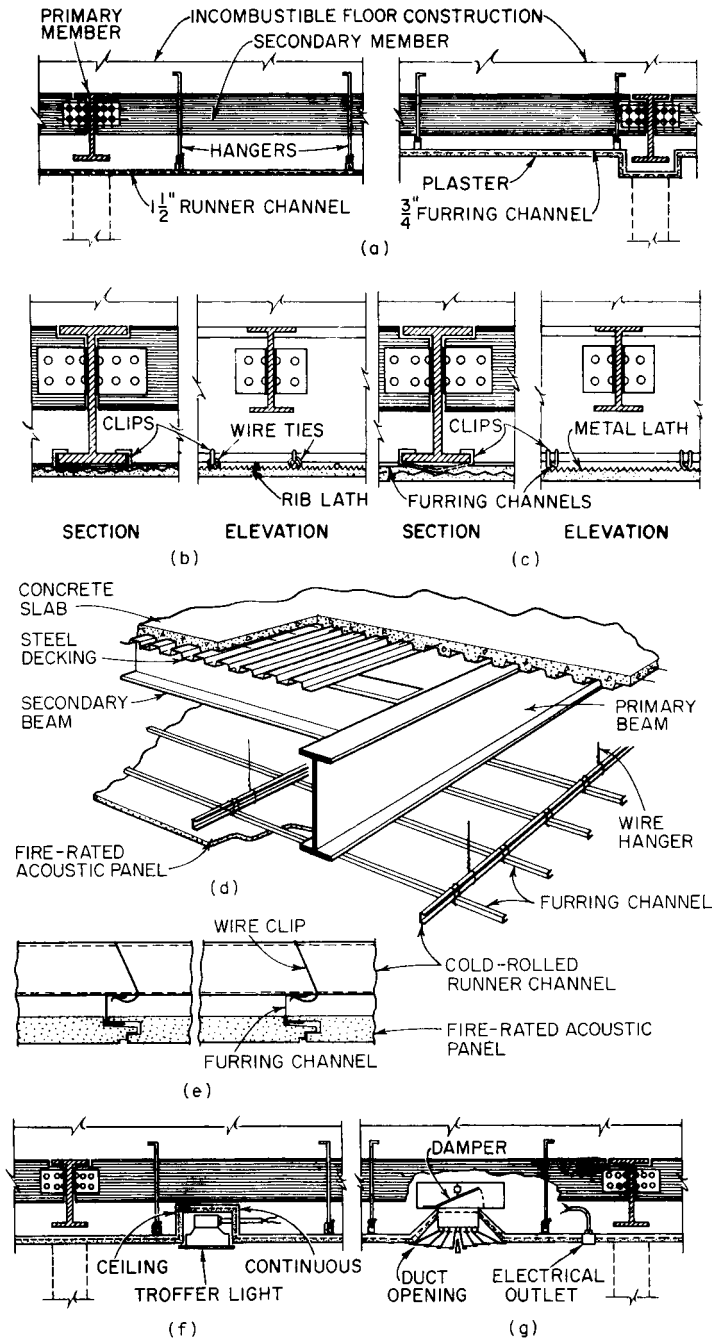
Fire protection of floor framing with incombustible floor construction: (a) section showing suspended plaster ceiling; (b) attached plaster ceiling; (c) furred plaster ceiling; (d) suspended ceiling with lay-in, fire-rated acoustic panels; (e) detail of panel support in (d); (f) detail showing fire protection around recessed lighting; (g) detail showing fire protection around air-conditioning duct
